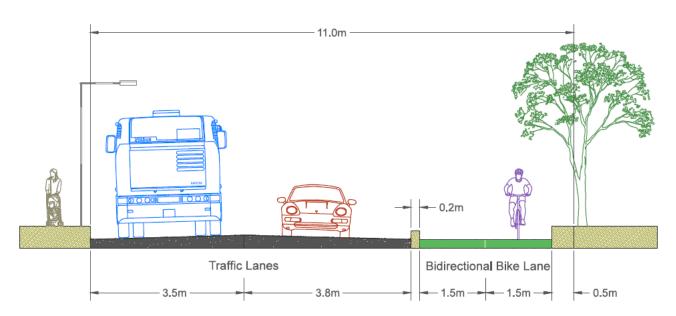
Proposed bidirectional cycleway on Walker Street, looking north.
